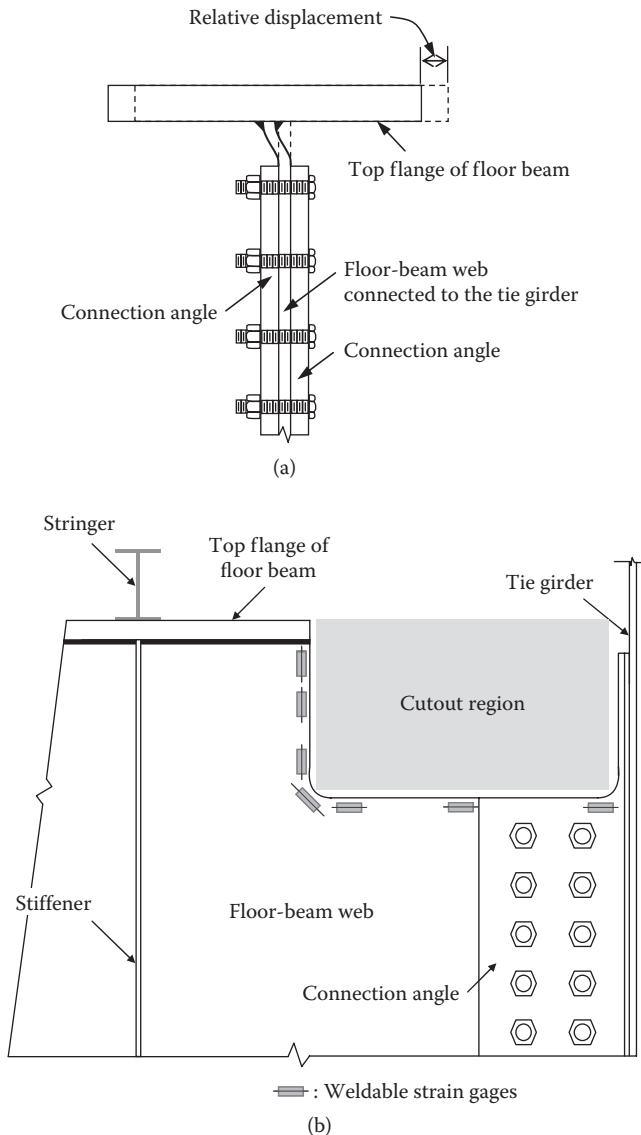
Schematic showing (a) relative displacement occurring between the floor beam and the tie girder and (b) floor-beam connection details after retrofitting and placing the sensors. (Adapted from Connor, R.J. et al., ATLSS Report No. 04-04, Lehigh University, Bethlehem, Pennsylvania, 2004.)
